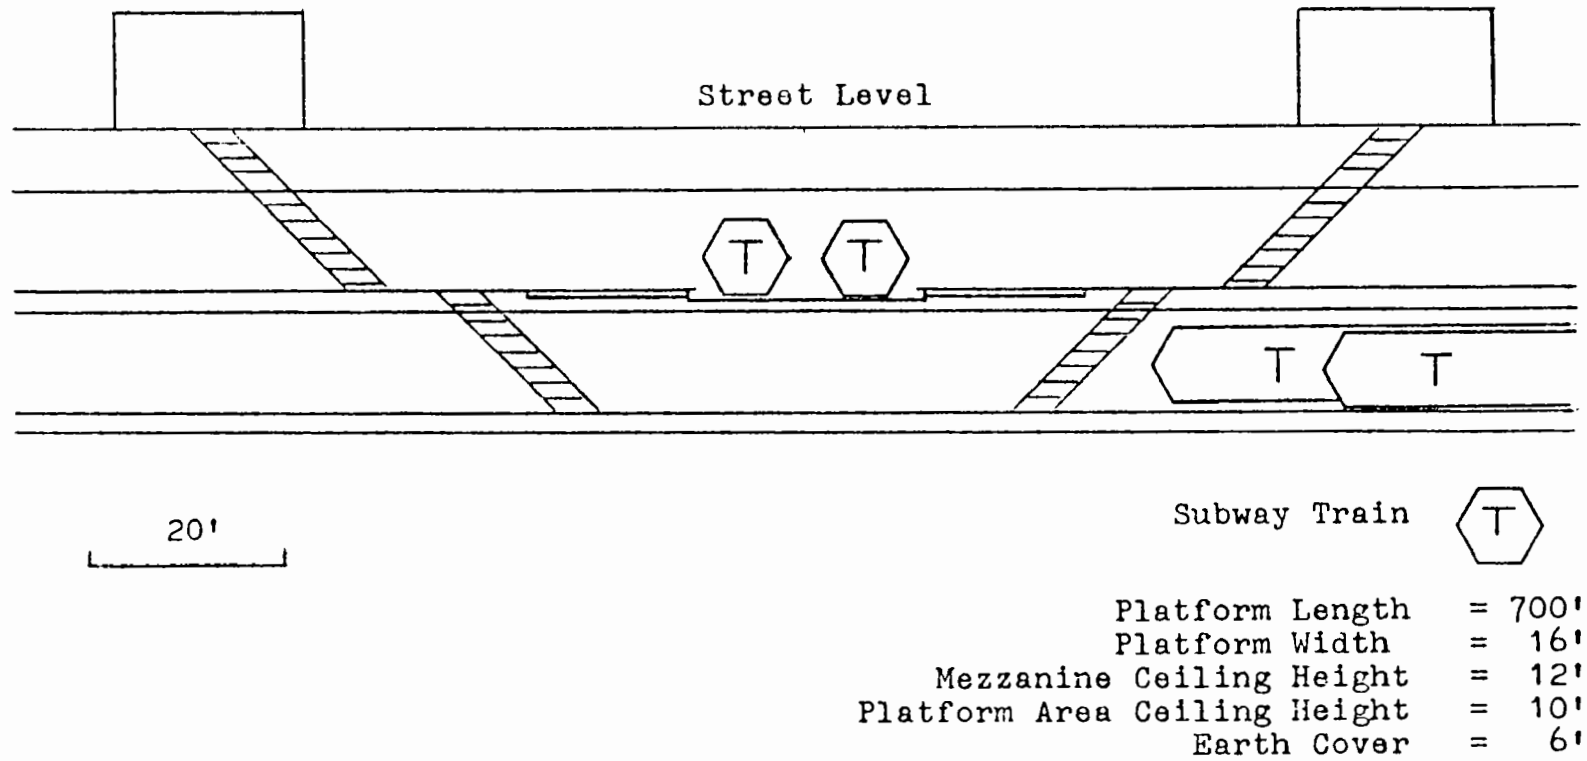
Alternative 1: Mezzanine Separate from Trainroom and at Street Level, Side Platform
